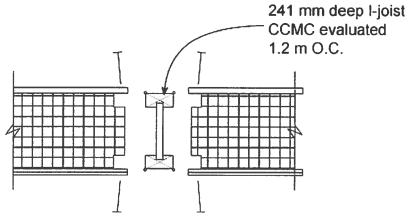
"Insulspan SIP System" – structural roof panels with lumber or prefabricated I-joists at 1.2 m o.c. See manufacturer's details for sealant and tape requirements
